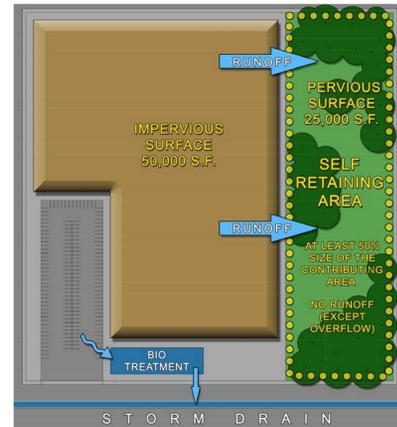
Schematic Drainage Plan for Site with a Self-Retaining Area
